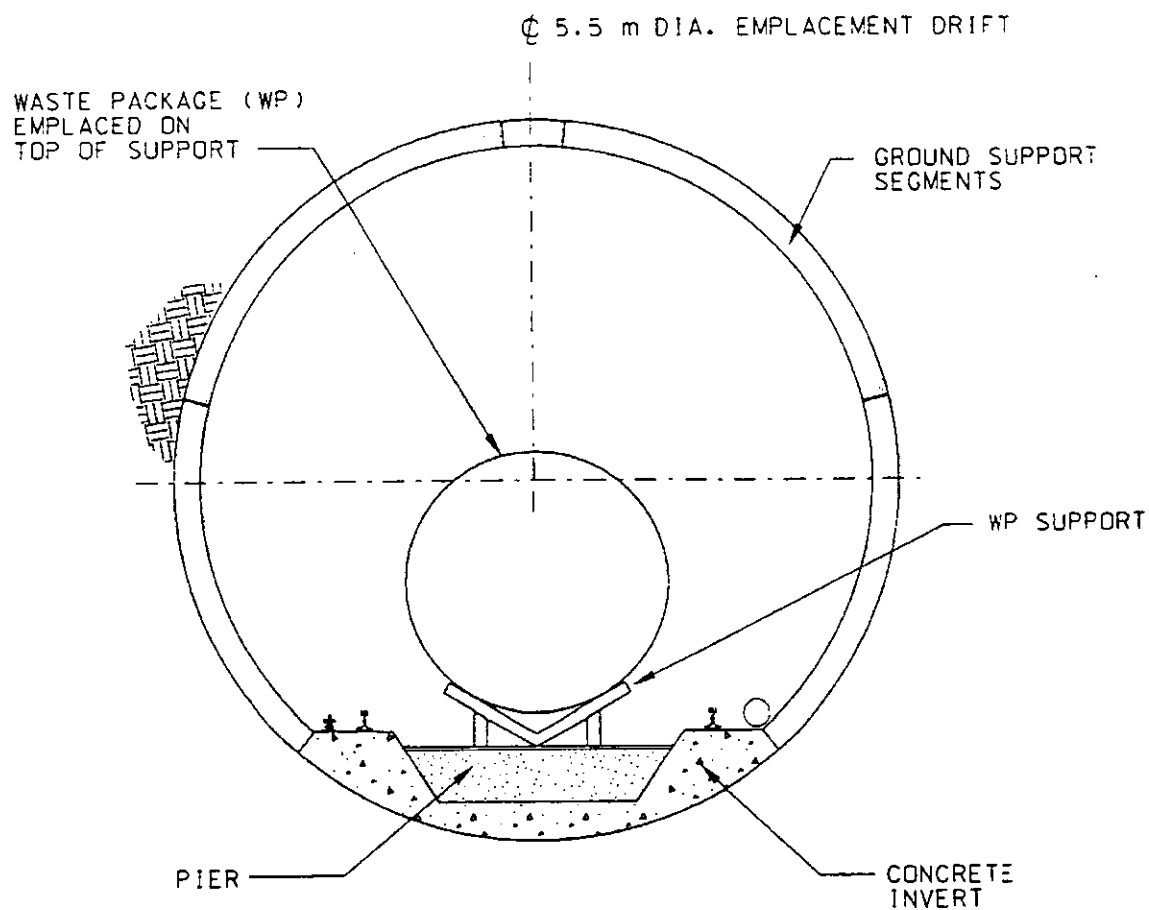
Emplacement Drift Section at Waste Package Support Location (Source: DOE 1998a, Volume 2)
